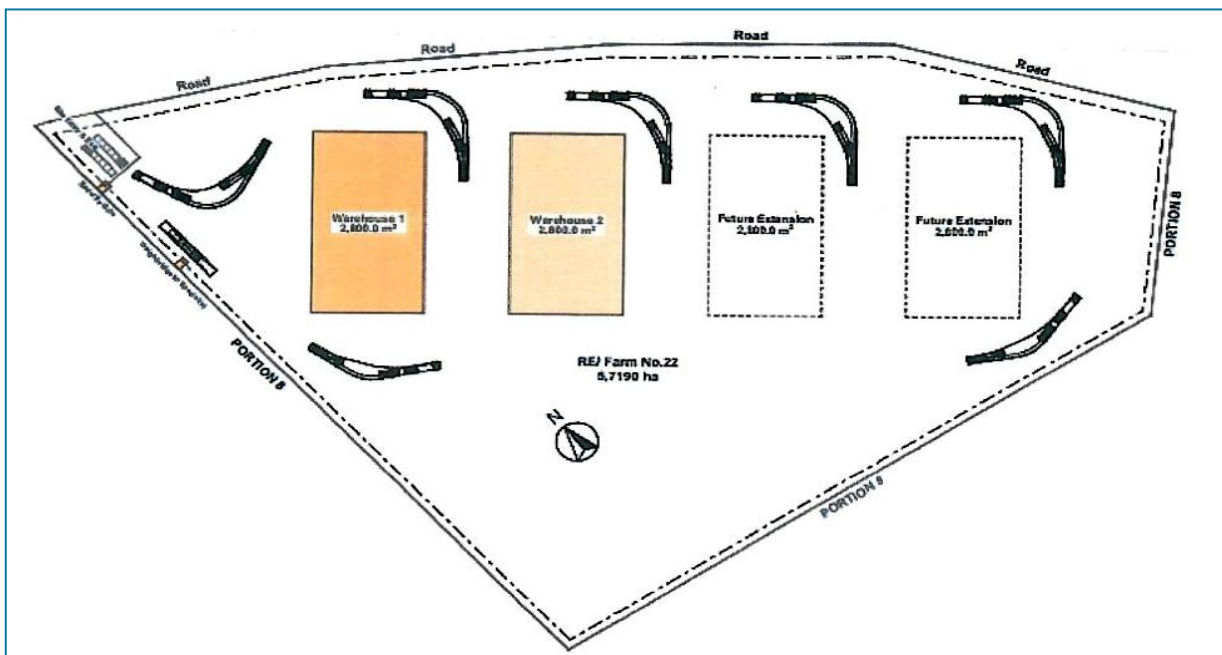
Schematic layout of the Proposed future Warehouse Facilities at Green Valley Farm No. 22
